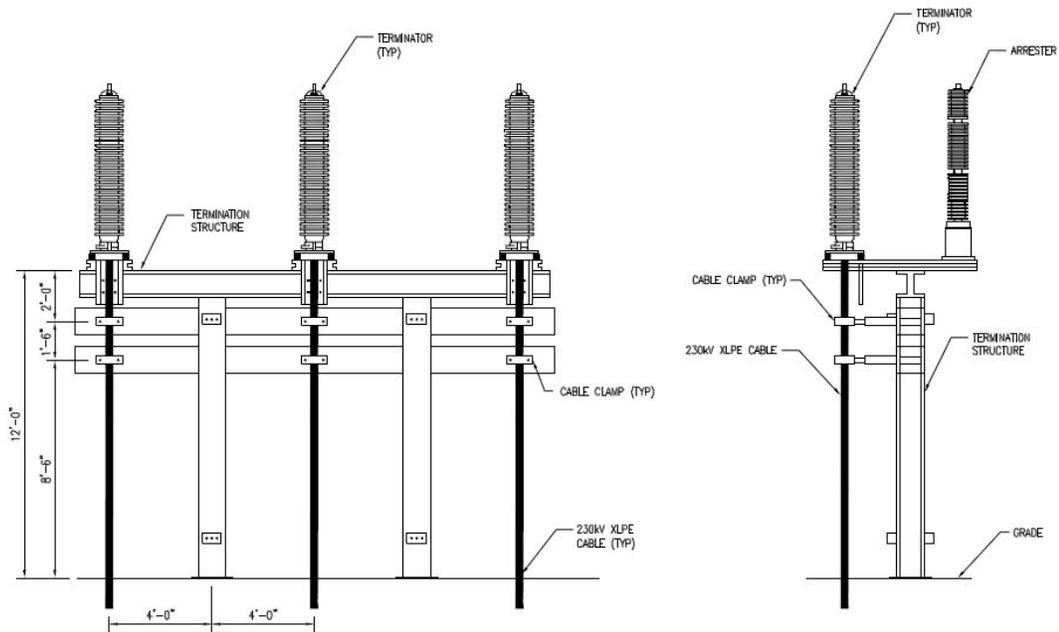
XLPE or HPFF Low Profile Transition Structure Schematic
